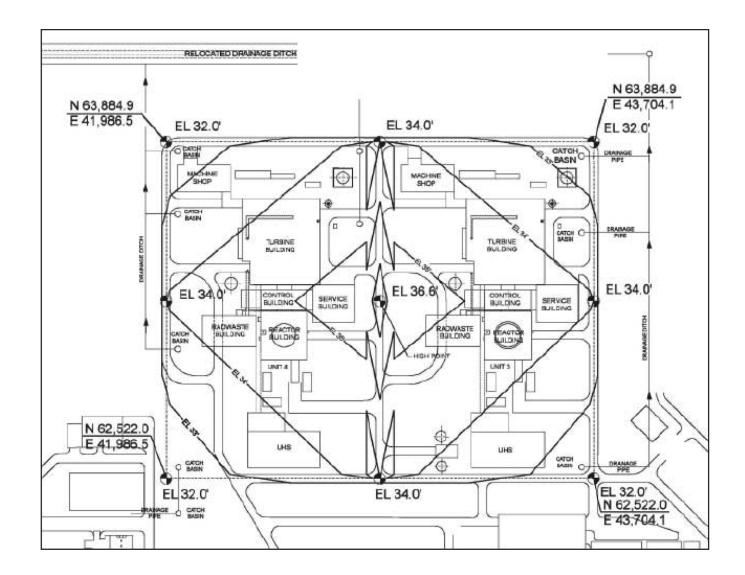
S.4-14 Units 3 and 4 Site Grading Plan
